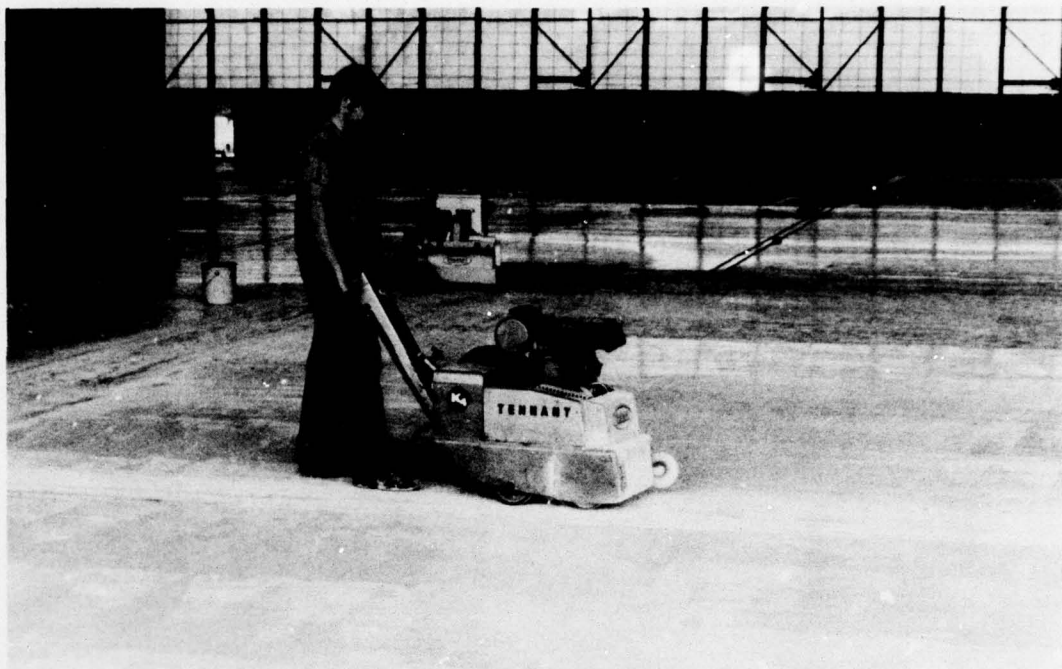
Removal of the CRU using a K-4 scarifying machine.
